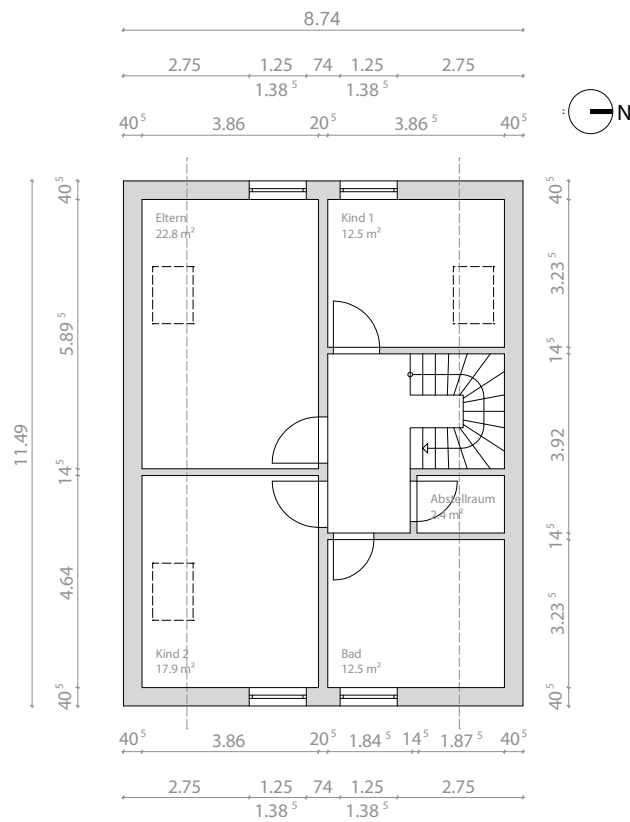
Plan of the upper floor of the modeled building (Constantin et al., 2014).
